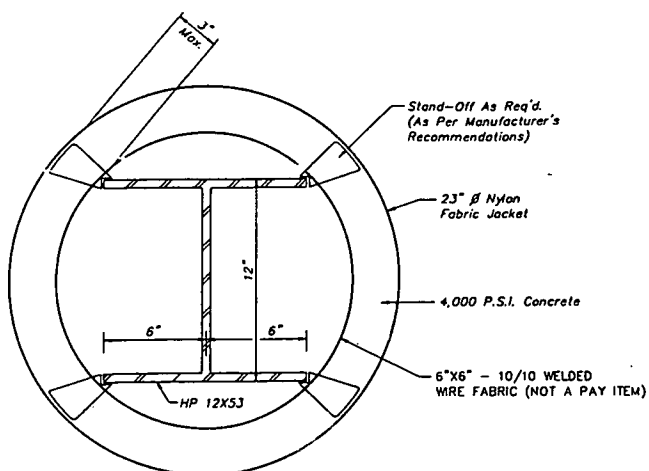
Steel pile concrete jackets. (From Mississippi DOT plan).
